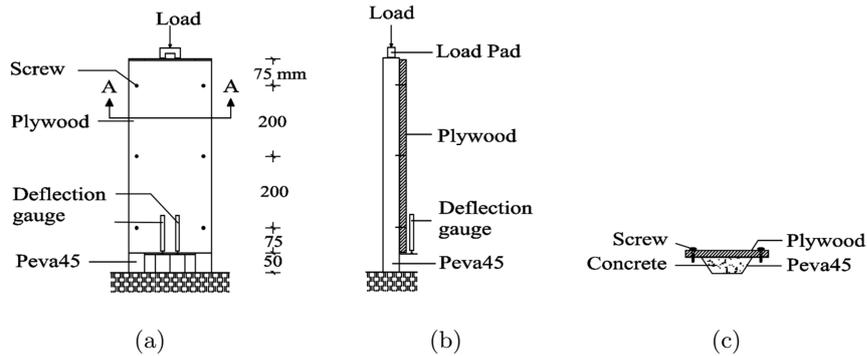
Detailed arrangements of the push-out test: (a) Front view (b) Side view (c) Section A-A.
